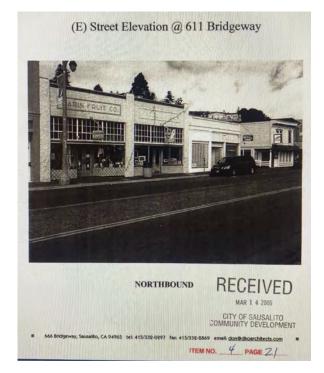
1998, existing condition of proposed storefront alteration (City of Sausalito, digitized building records)
